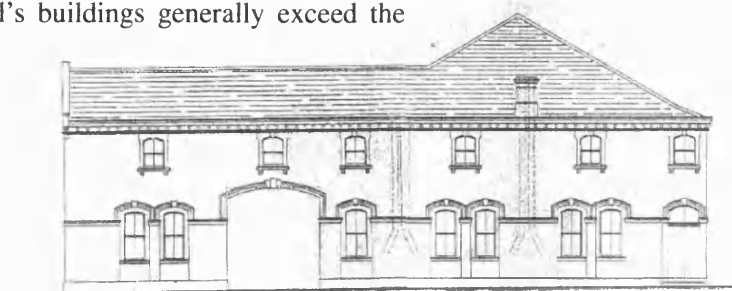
Pulteney Road (south) development: elevation Block C. Building Control Plan.
